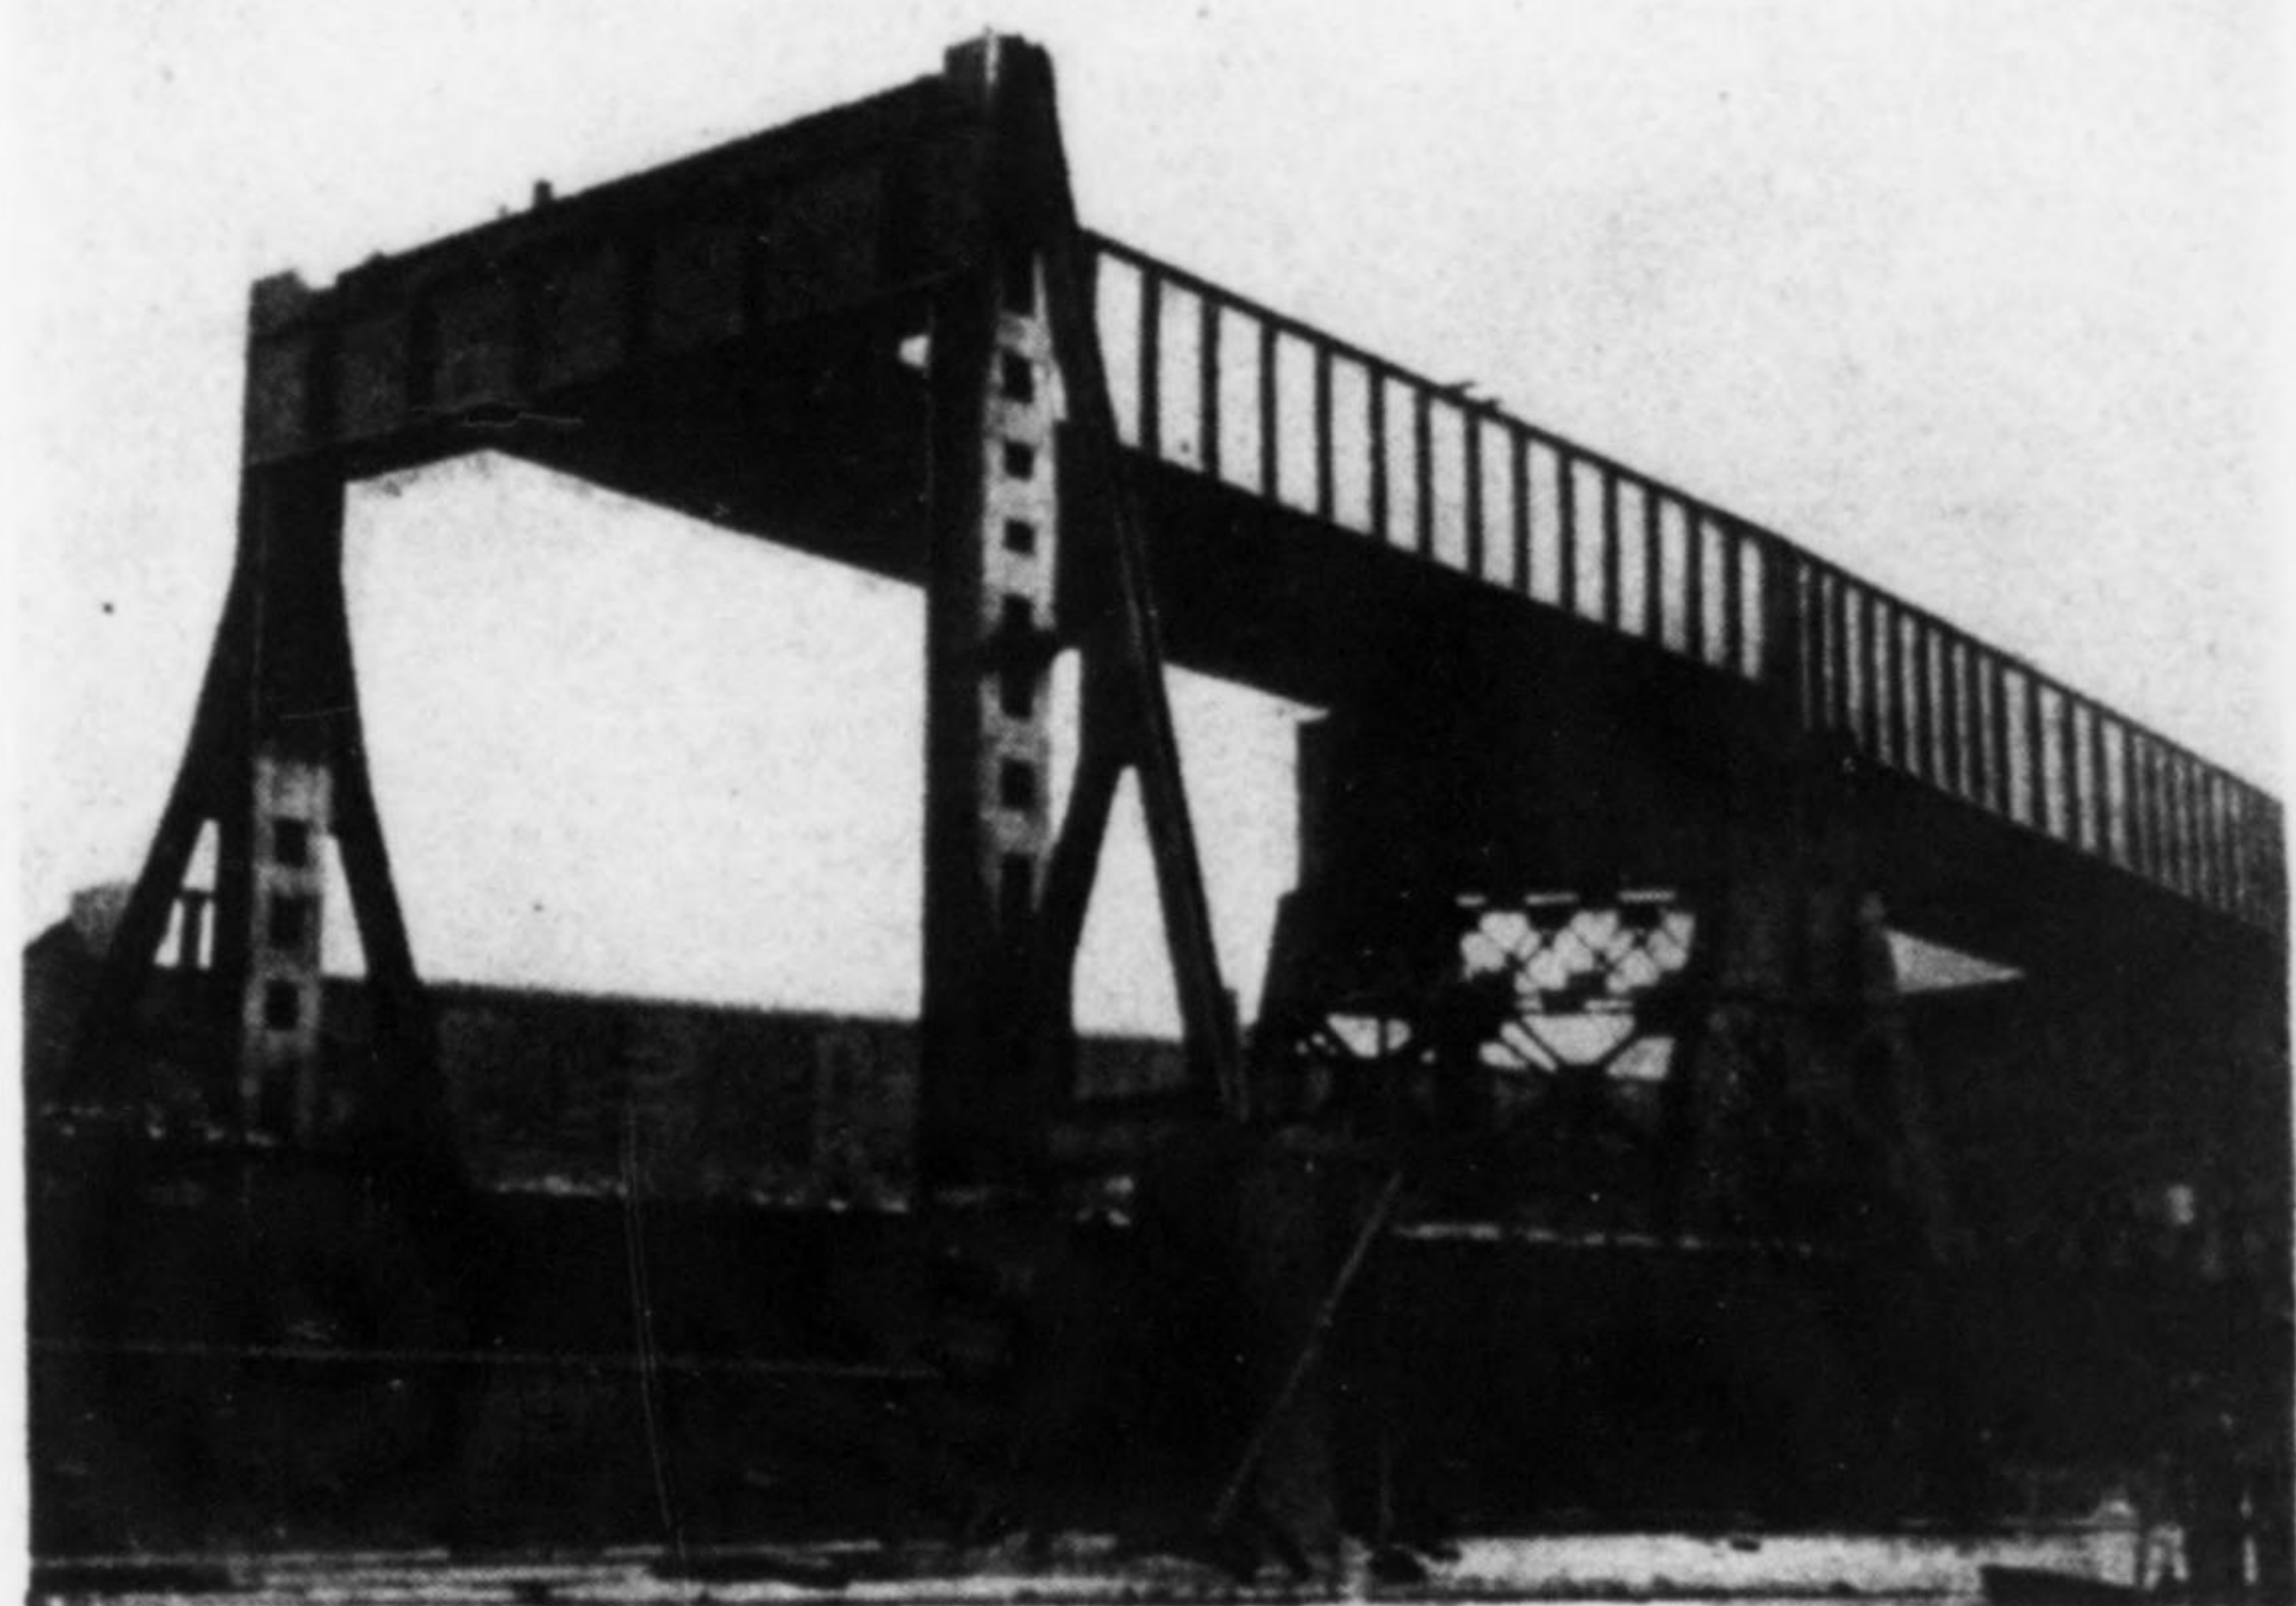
SPECIAL VIADUCT CONSTRUCTION
